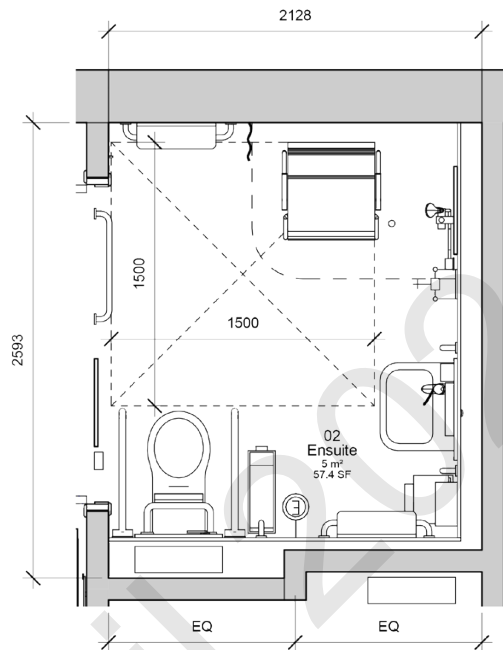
Nested En-Suite, Back-to-Back Arrangement (not to scale)
